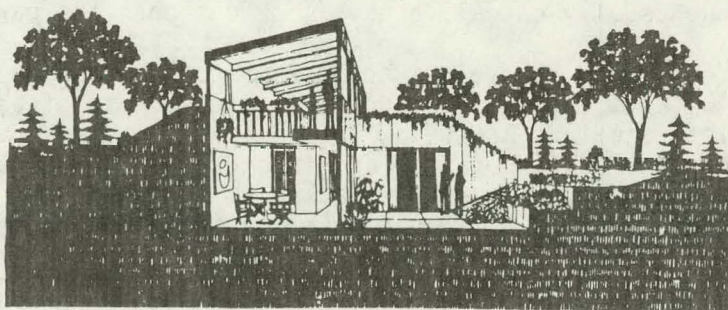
Earth protected house, a preliminary design (drawn by John Carmody).
